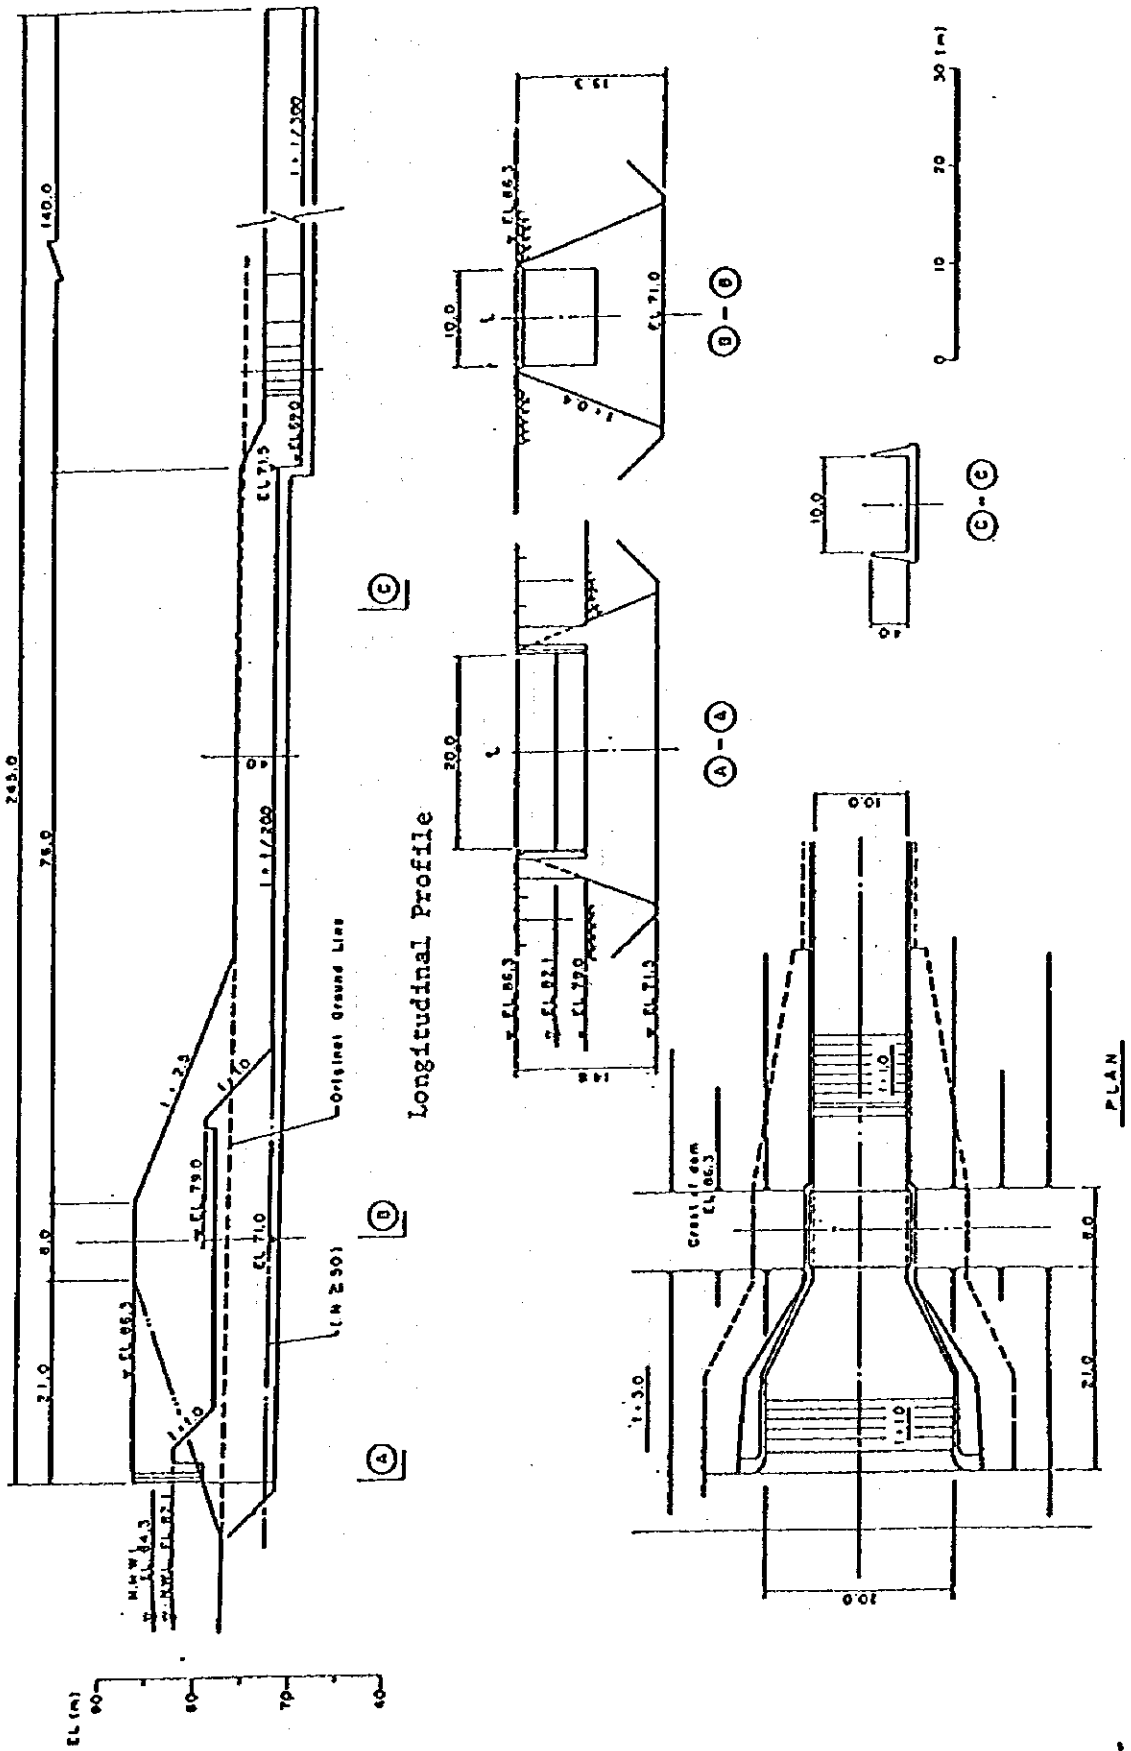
Longitudinal Profile of Intake and Outlet Facilities of Ban Bung Dam
